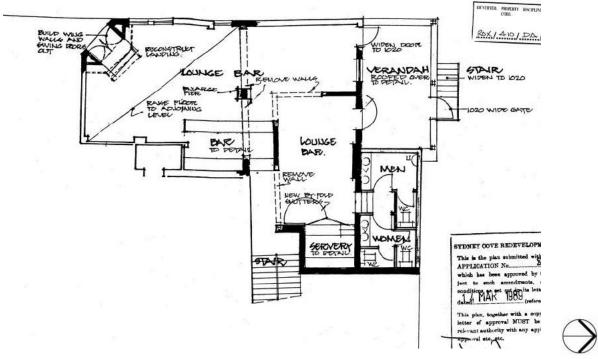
1989 works to the rear section of 139–141 George Street. The sections of wall between 139–141 George Street and 137 George Street had been planned as part of the 1985 construction of 30–32 Nurses Walk, but this work was deleted from the scope and the area fitted out as a commercial space rather than a lounge bar $^{127}$ . In 1989, however, approval was granted for the lounge bar with a plan similar to that shown in 1985. Source: PMNSW – ROX 410 DA 0016-DR.
